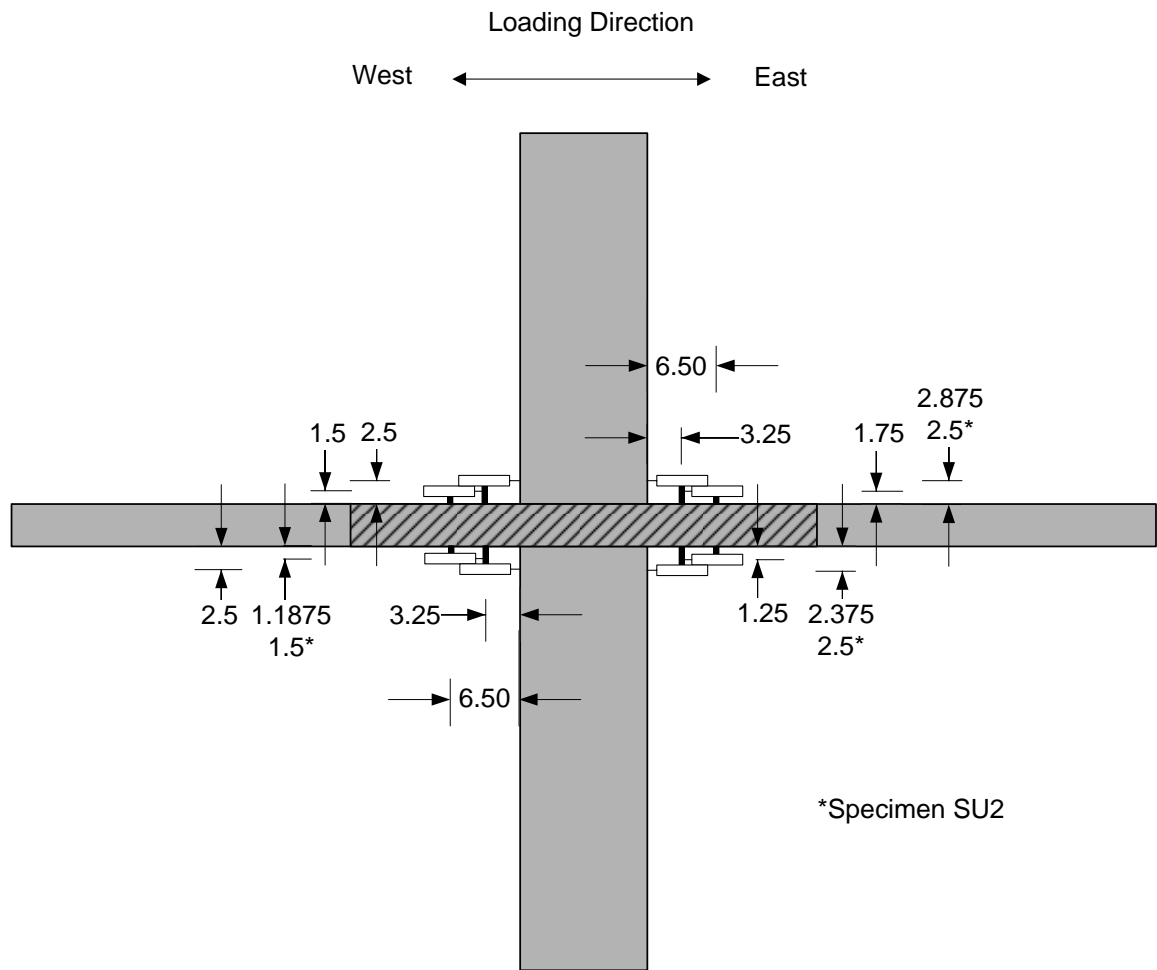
Strain Gauge Labels and Locations for Specimens SU1 and SU2 (Top Reinforcement)
